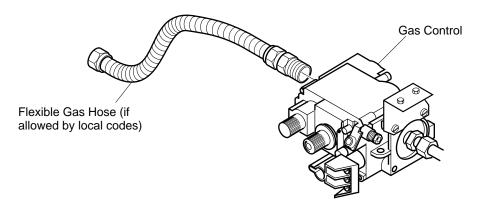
Attaching Flexible Gas Hose to Heater Gas Regulator
